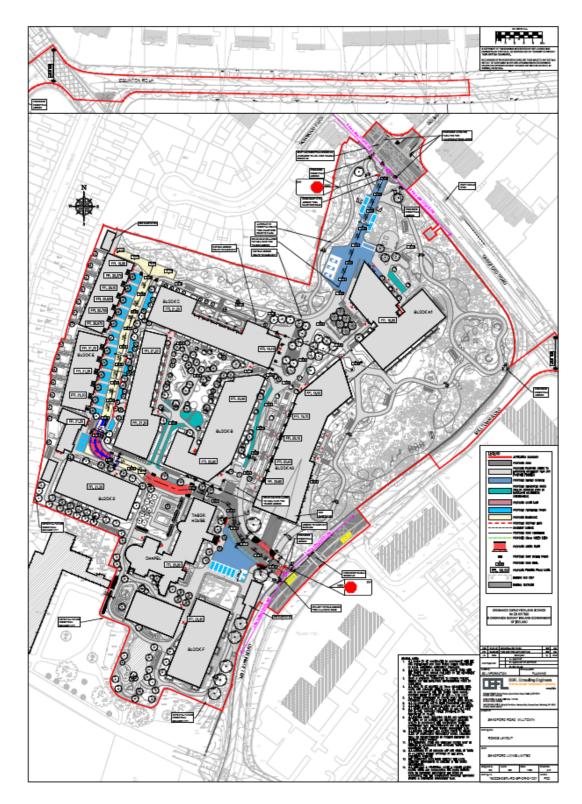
Subject Site Road Layout (Source: DBFL)
